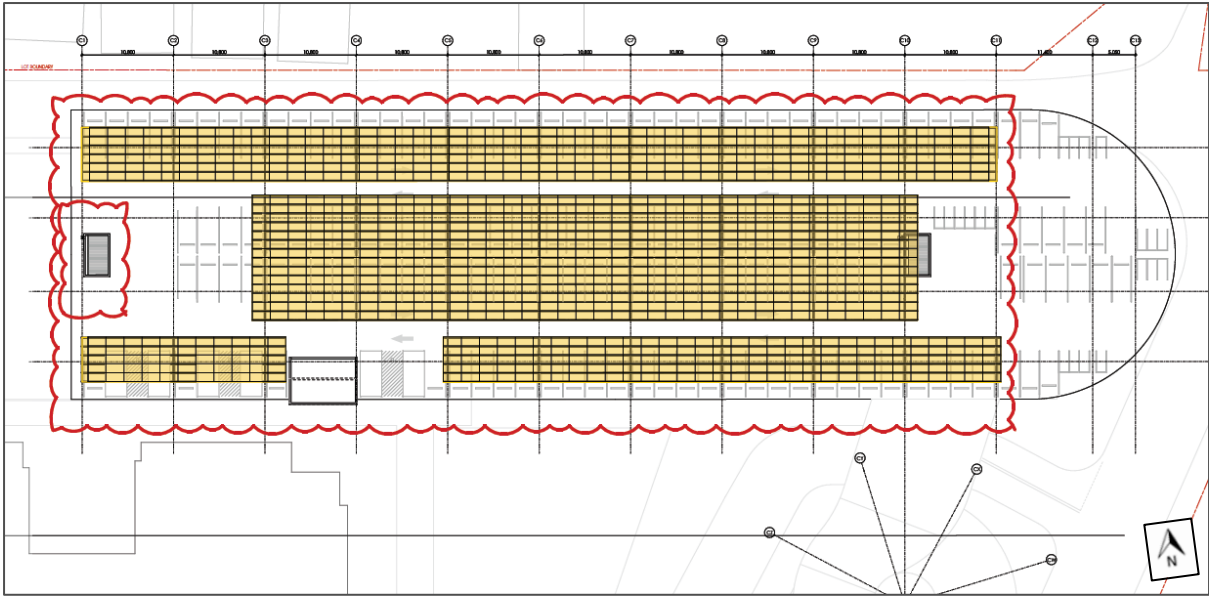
| Proposed roof plan, solar panels shown in yellow (Source: Applicant's Modification Report 2021)
